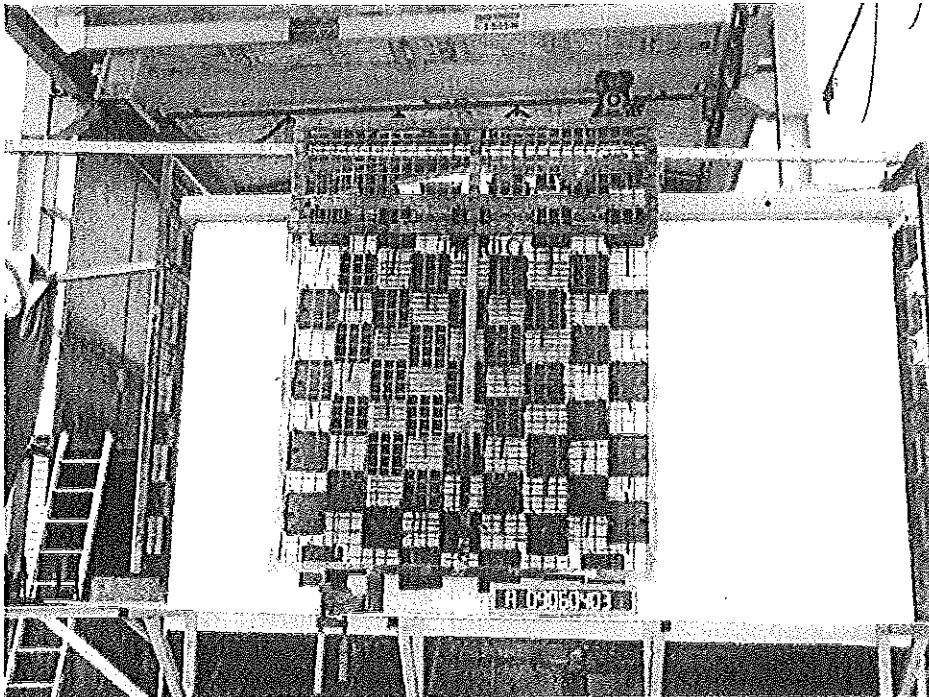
Left side view of the test object with indicators before test no. 090604-03
